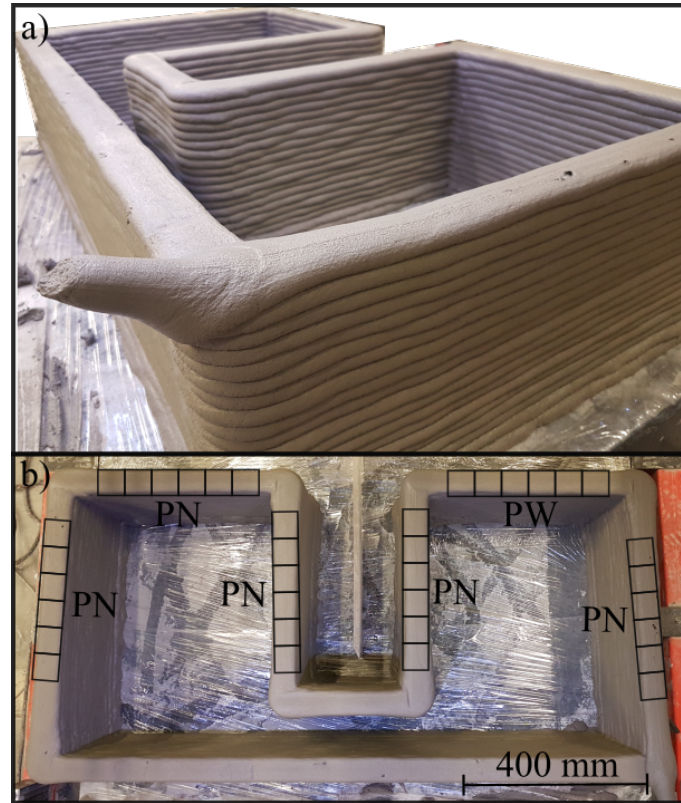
a) Perspective view of the element printed (image with REF). b) Plan view of the printed element and layout of the test specimens. The printed specimens exposed to the higher airflow speed are denoted as PW, while PN is used for the lower airflow speed.
